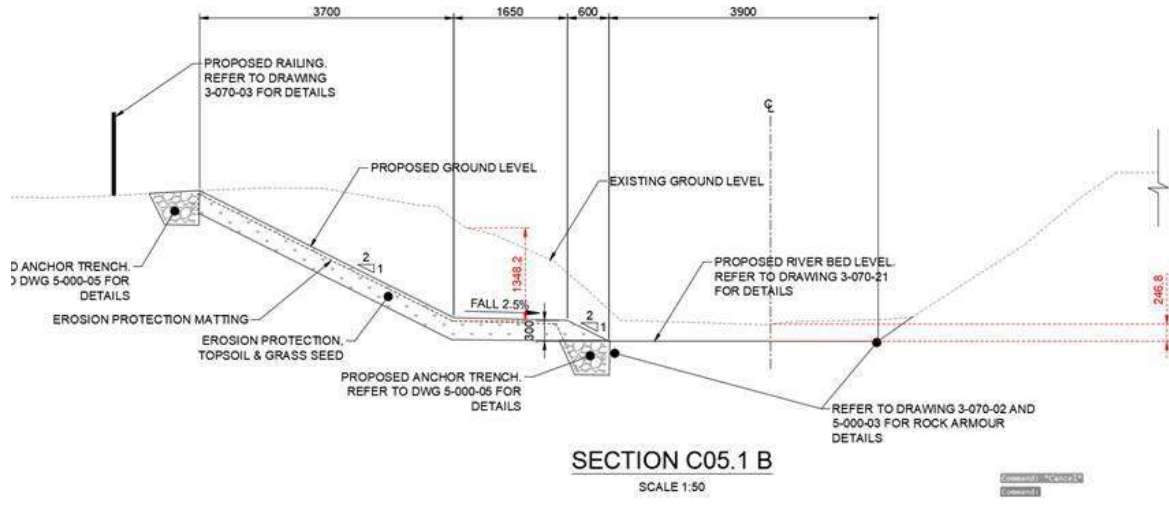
Cross-section of proposed river lowering and widening. Lowering will occur through the existing channel thalweg, and widening to introduce a 2-stage channel only to be wetted during flood flows
